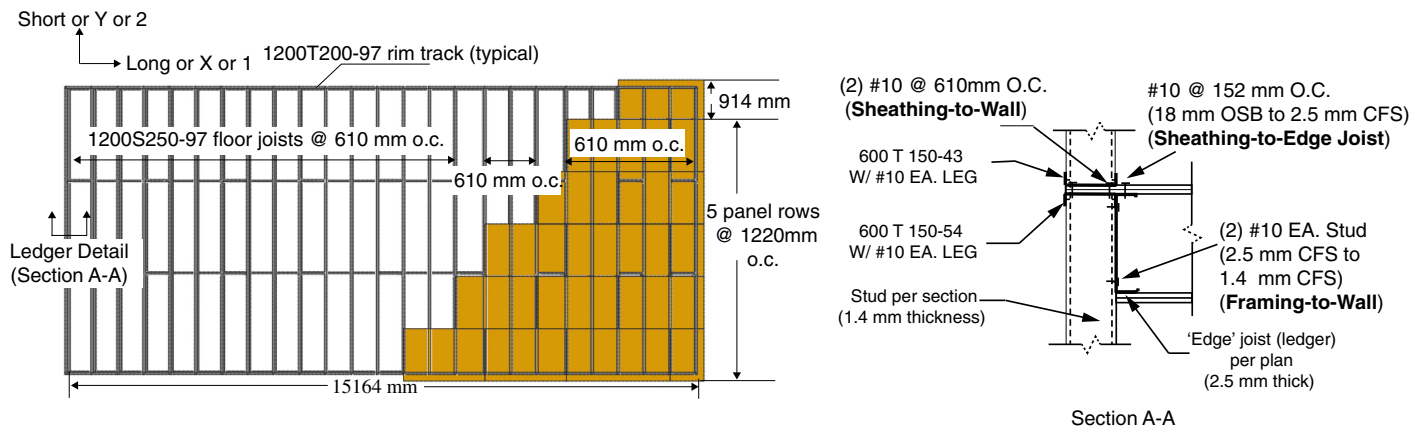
Wood-sheathed floor diaphragm layout showing cold-formed steel joists, rim tracks, and staggered oriented strand board (OSB) panels; Section A-A shows the ledger framing detail where the floor frames into the short-direction shear walls and the sheathing is sandwiched within the wall (data from Madsen et al. 2011)
